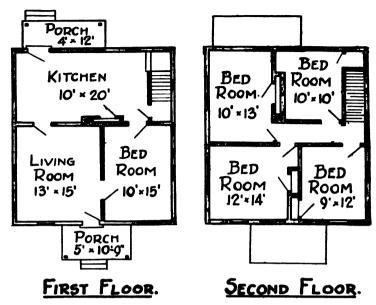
FIRST AND SECOND FLOOR PLANS OF DETACHED FRAME HOUSE FOR MINERS IN ANTHRACITE REGION,
